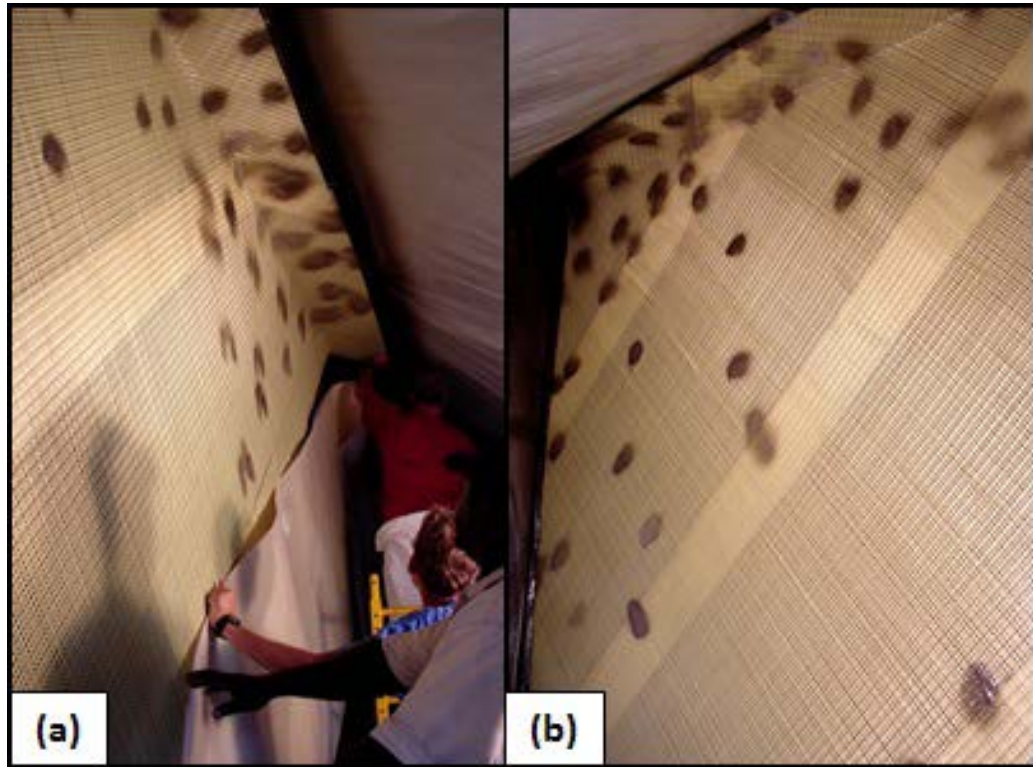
Fabric application. (a) Fabric placed diagonally on wall to provide fiber reinforcement in ± 45 -deg orientation. (b) Spray-on polyurea was used to anchor fabric to wall during application.
